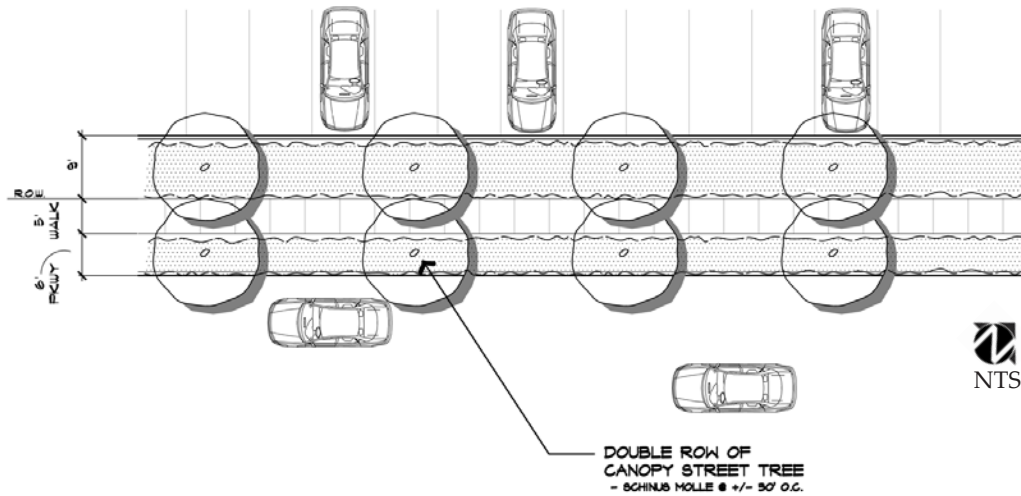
Ontario Center Parkway (East of Via Asti) Public Streetscape Section and Plan
